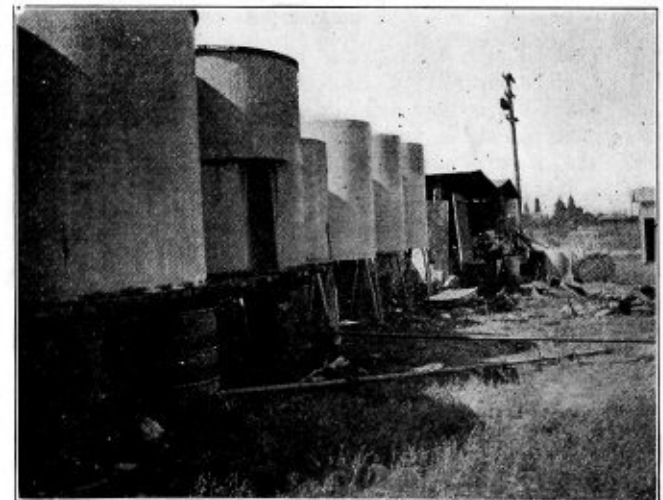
Battery of all-welded oil storage tanks
